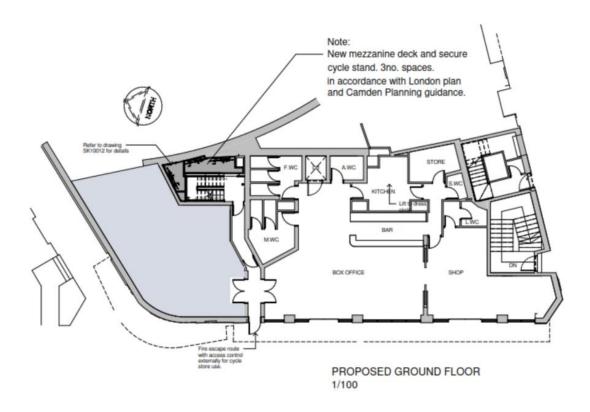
Approved Theatre Ground Floor Plan and proposed new cycle storage location
